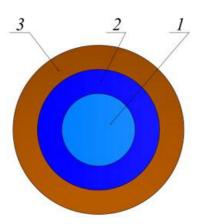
Cross-section of the drill injection pile-ERT. 1 - reinforced concrete section of pile-ERT; 2 - cementation zone; 3 - sealing zone.
